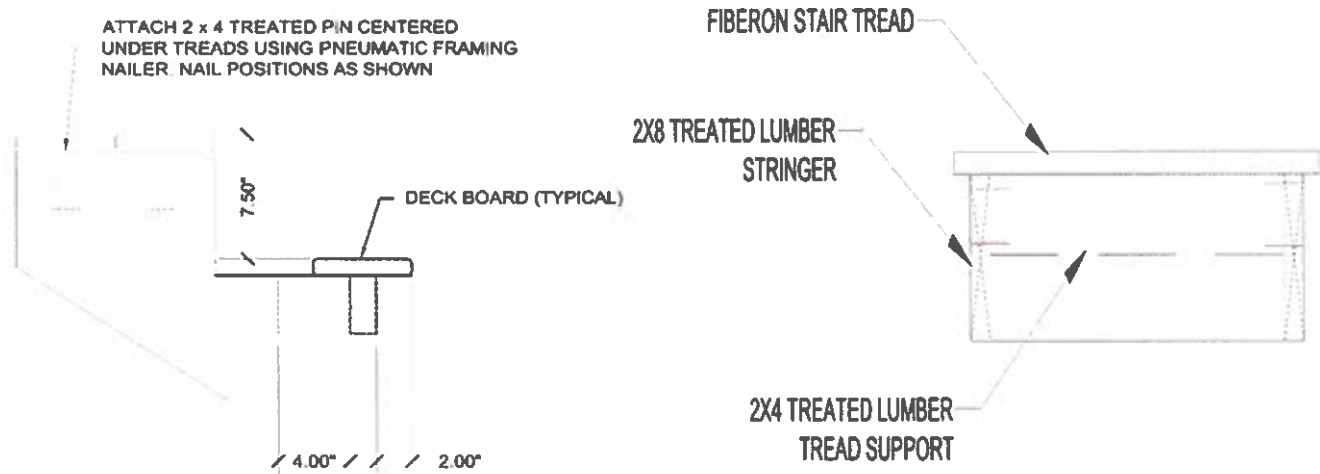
Fiberon Paramount® and Promenade PVC Stair Tread Installation
